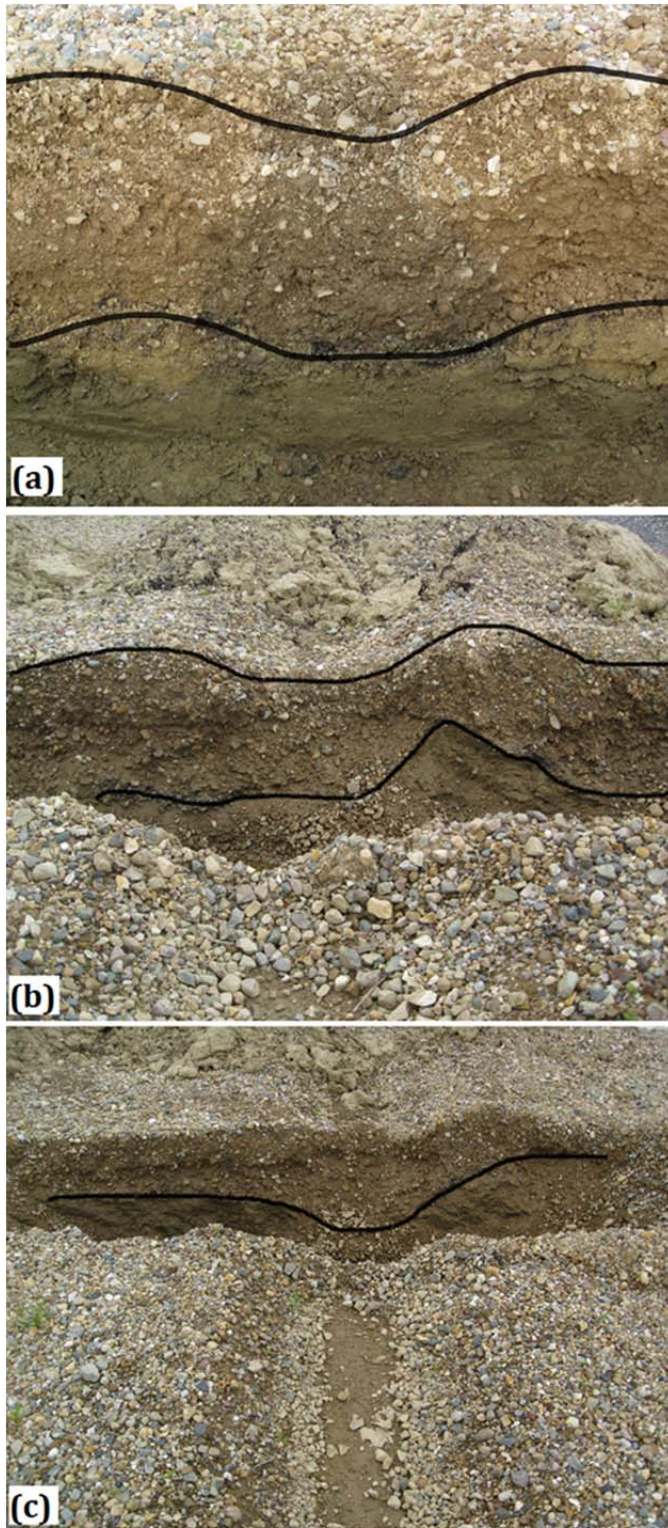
Excavated trench photos showing surface and base-subgrade interface deformations in test sections (a) 1, (b) 2, and (c) 3 for Cell 1 due to loading under flooded conditions
